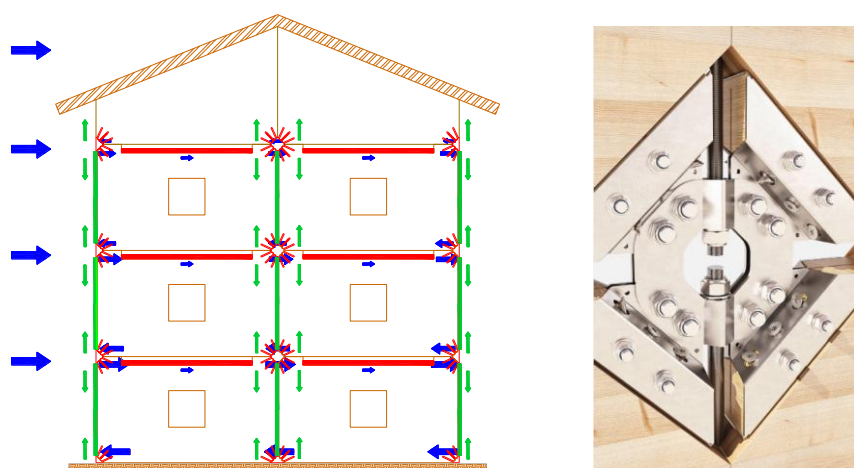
Load path into a CLT structure built by the use of X-RAD system with vertical steel rope (left) and detail of the wall-wall joint (right)
